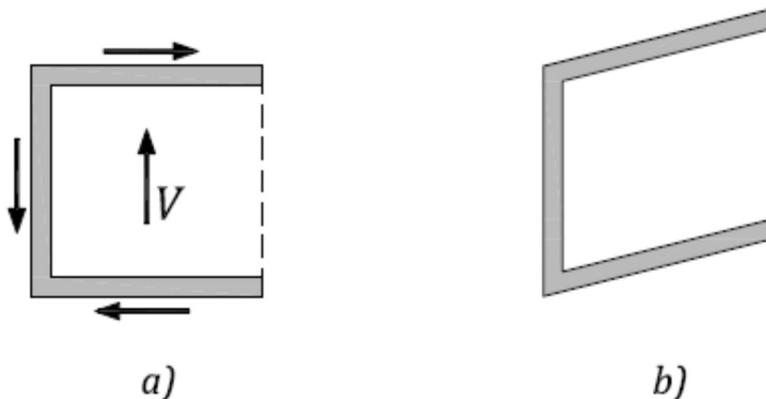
Building plan: a) loads on diaphragm; b) displaced shape of a flexible diaphragm.
